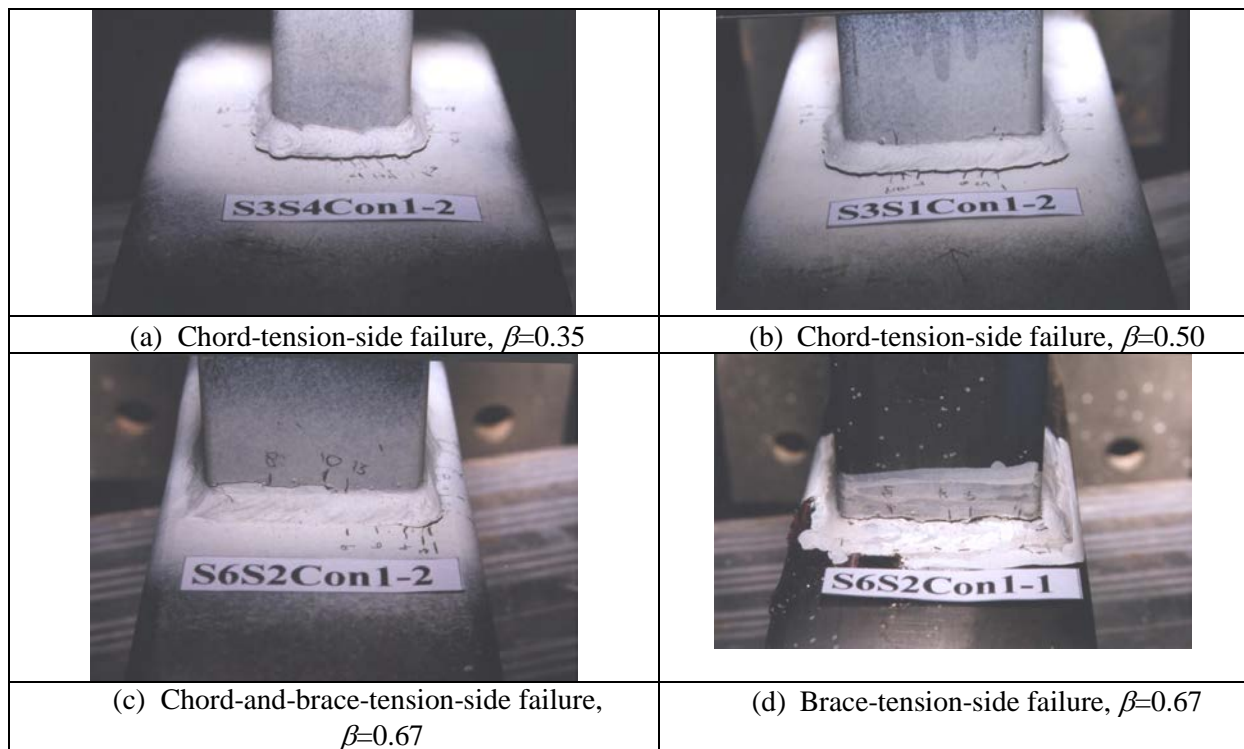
Failure modes in SHS-SHS T-joints with concrete-filled chords
